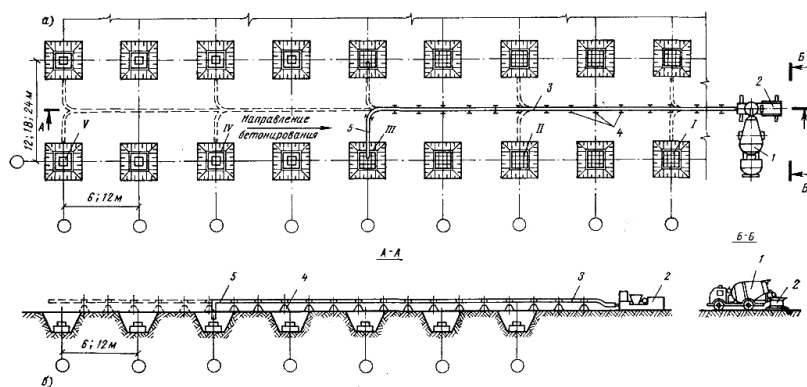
Scheme of the technological process for the installation of monolithic reinforced concrete foundations with concrete pumps
